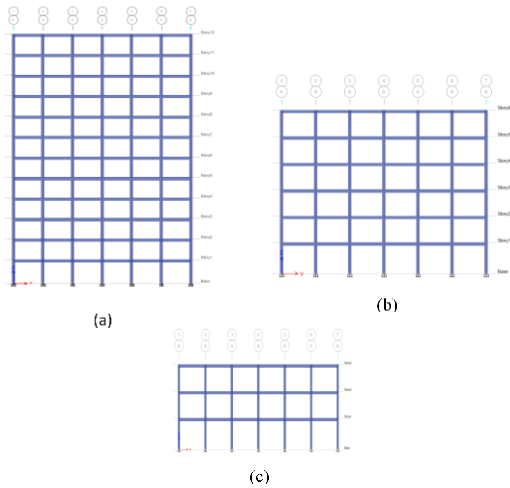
Model 1 for (a) 12 story building, (b) 6 story building and (c) 3 story building
